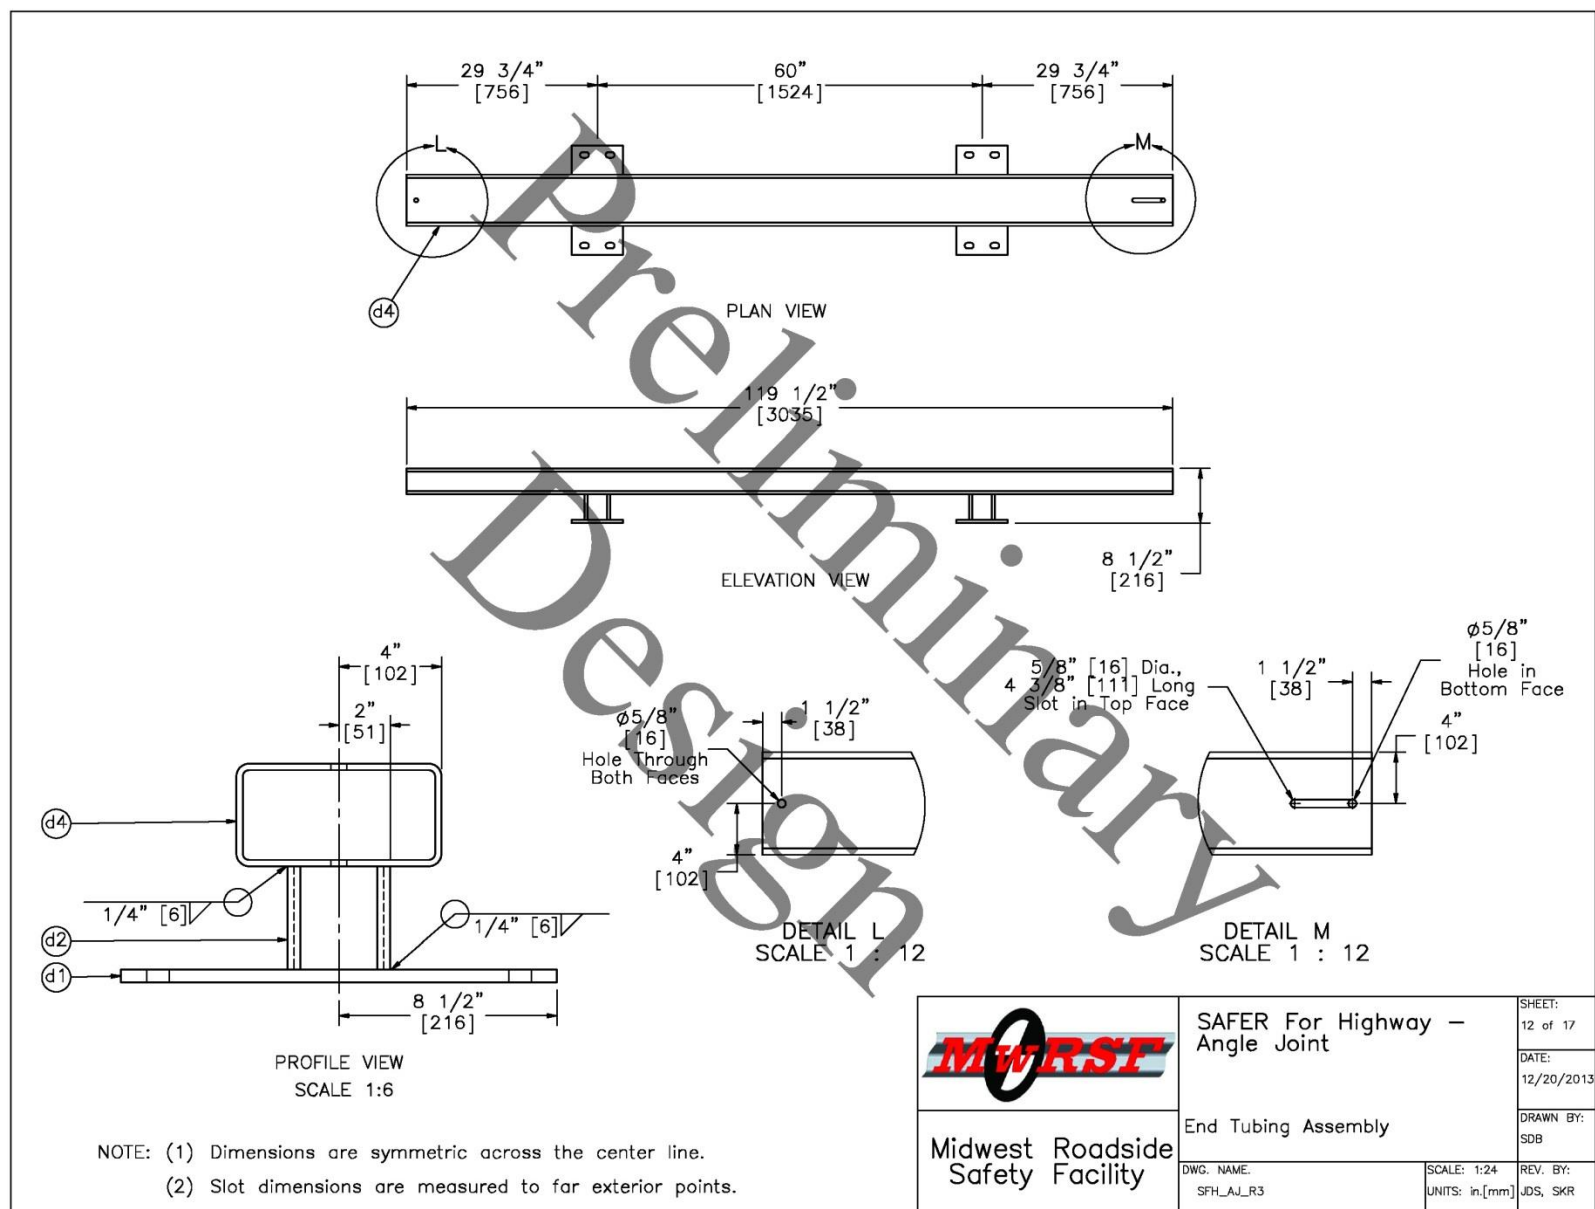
Preliminary Barrier Design, End Tubing Assembly
